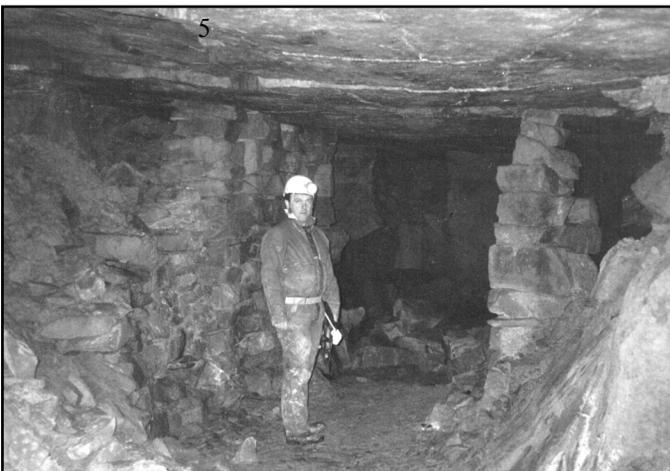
Dead stone built into walls and pillars to support the roof inside the mines (photo by M Parkes).
